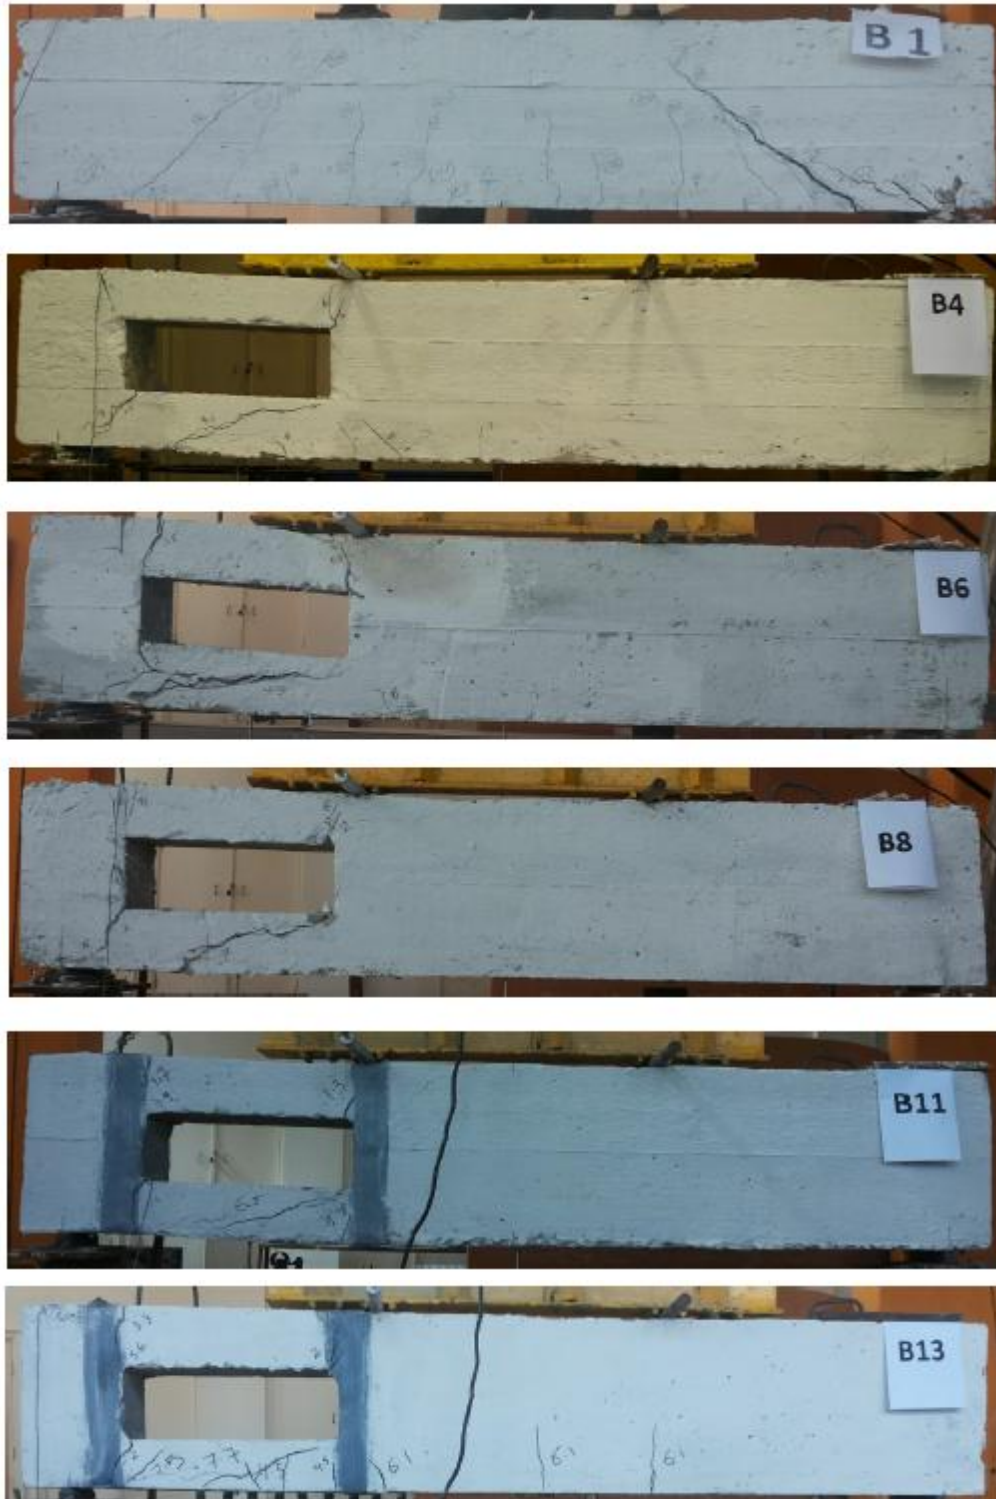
Crack Patterns for Control Beam and Beams with Rectangular Opening
